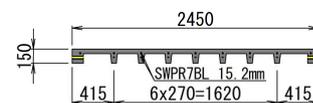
Standard panel: longitudinal section view (Fig. 4 B-B)
